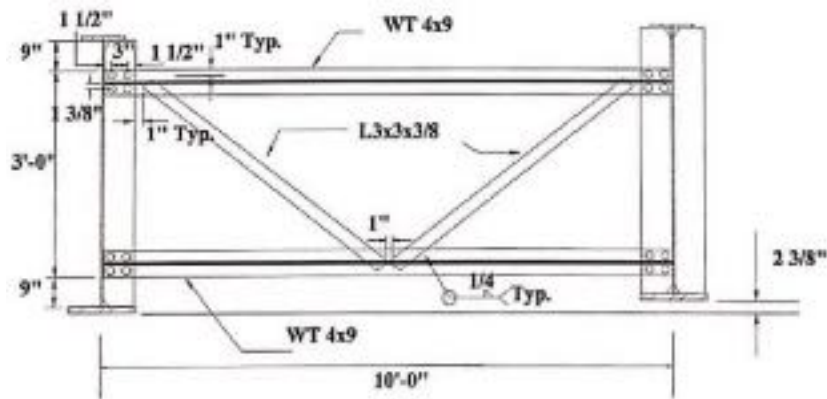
Typical K frame detail used in the Nebraska bridge.
